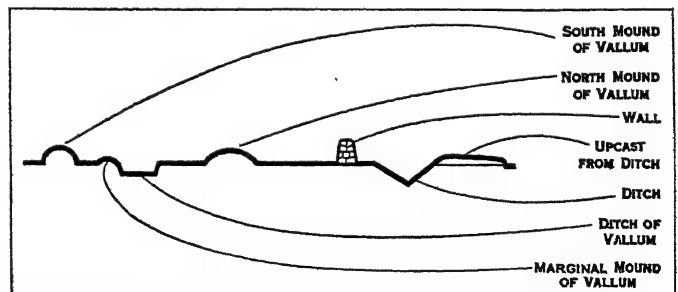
DIAGRAM SHOWING A SECTION THROUGH HADRIAN'S WALL
